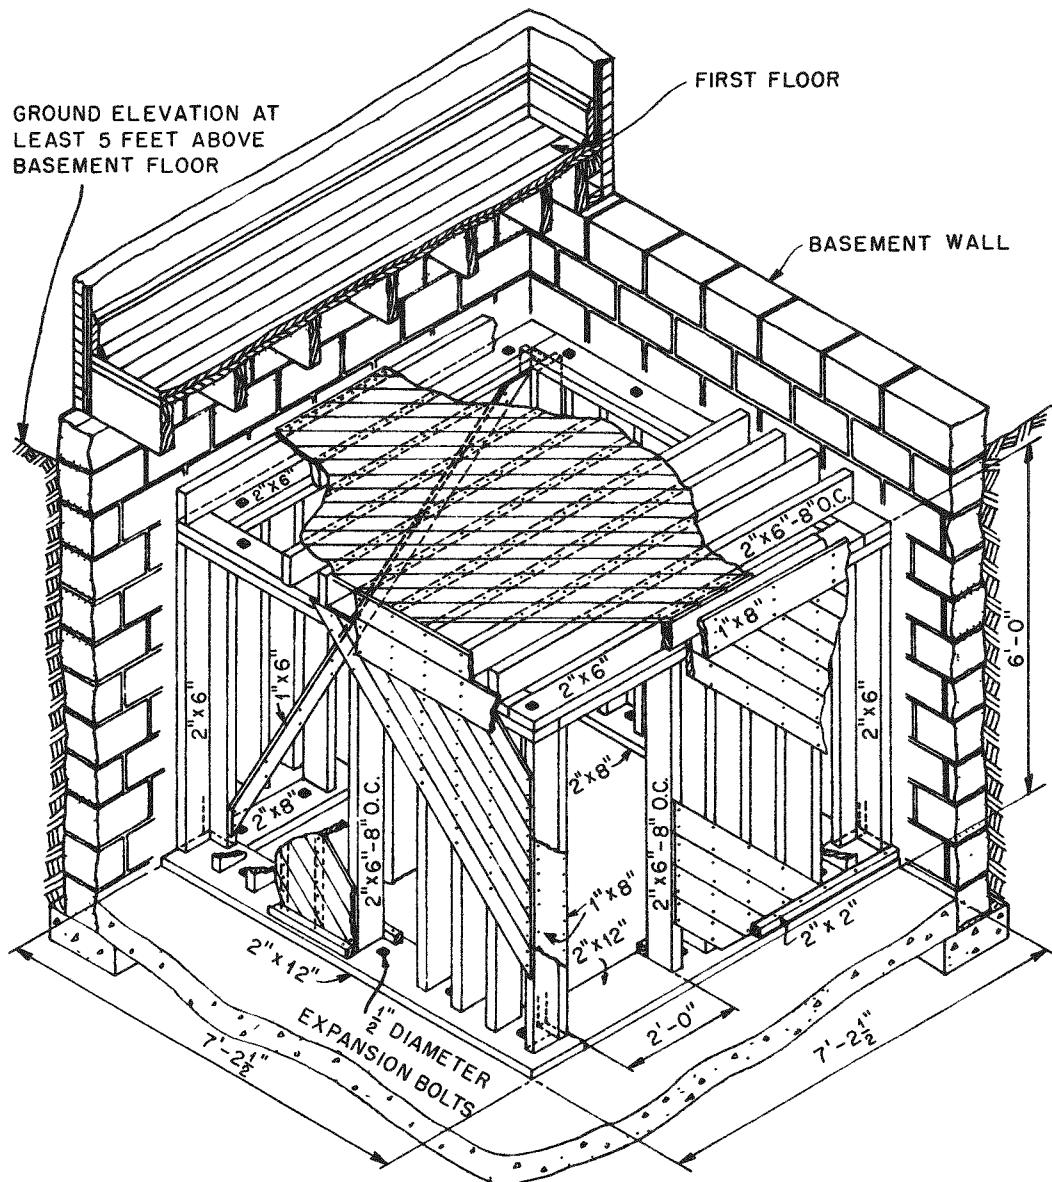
Basement corner room at 3500 and 7500 ft. All wood to be not less than No. 2 common. Roof to be prefabricated and erected as a unit.
